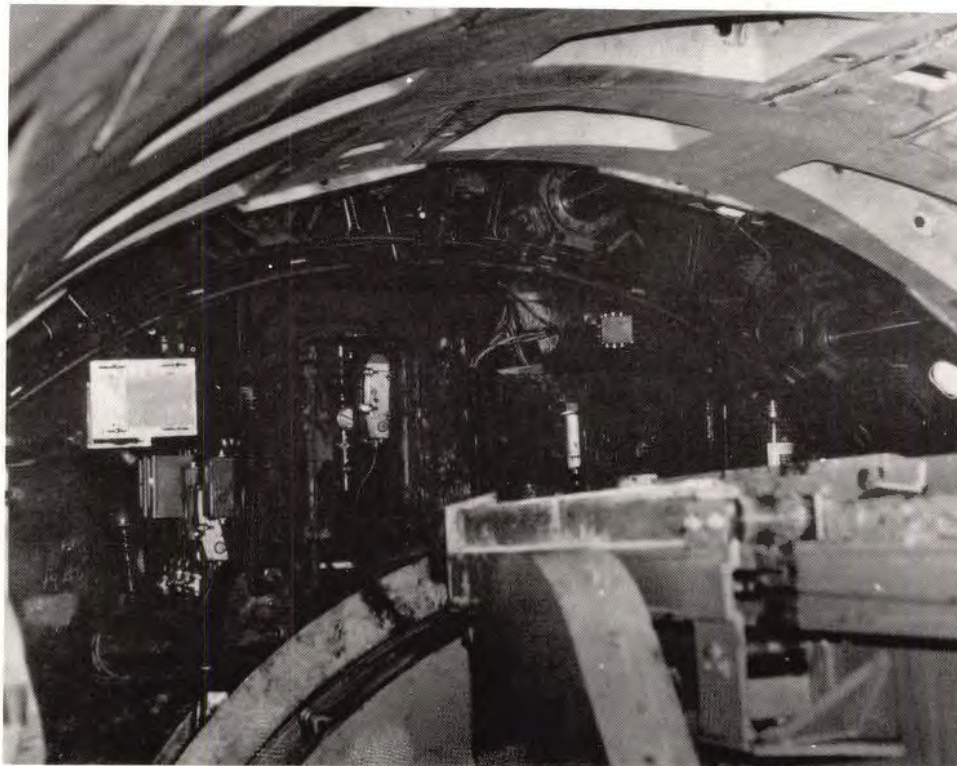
Wayss and Freytag bentonite shield and segmental concrete liner
